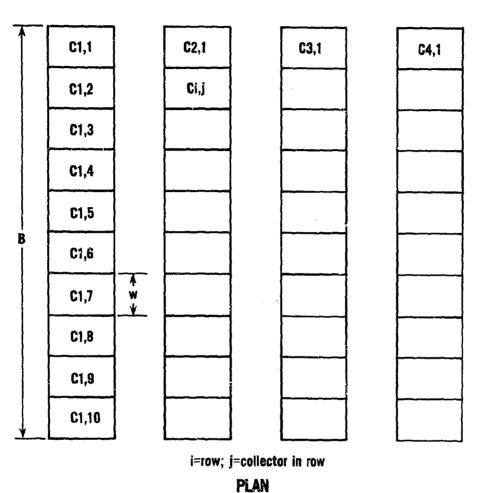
Collector Systems in Ground Installations Next to a Building - Berm Units.
